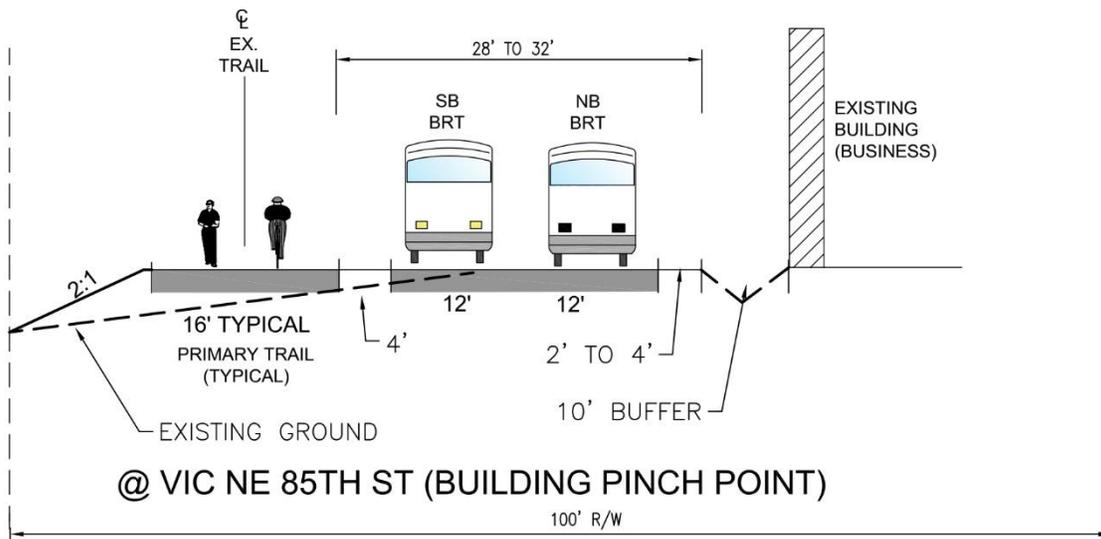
Typical constricted pinch/choke point for Kirkland Way to NE 85th Street segment
